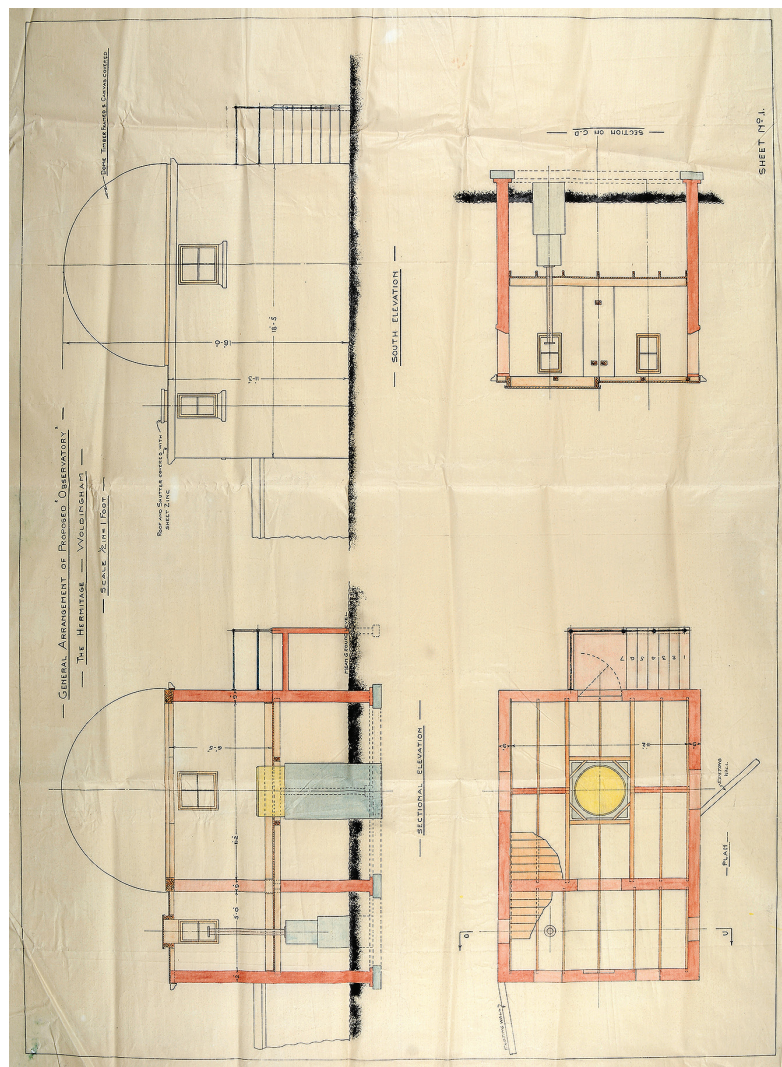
Plan of elevations and sections of a proposed astronomical observatory at the Hermitage, Woldingham, for GH Ryder, 1916 (SHC ref 3323/Box41 plan 3093)
